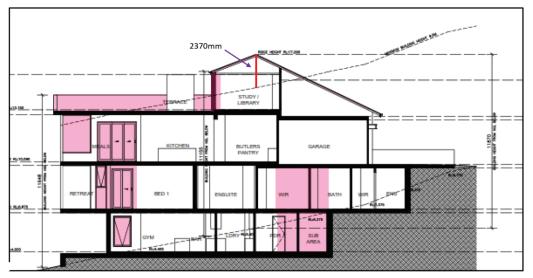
Figure C: Section plan of dwelling house showing existing HOB variation to 9.5m HOB development standard under RLEP 2014
